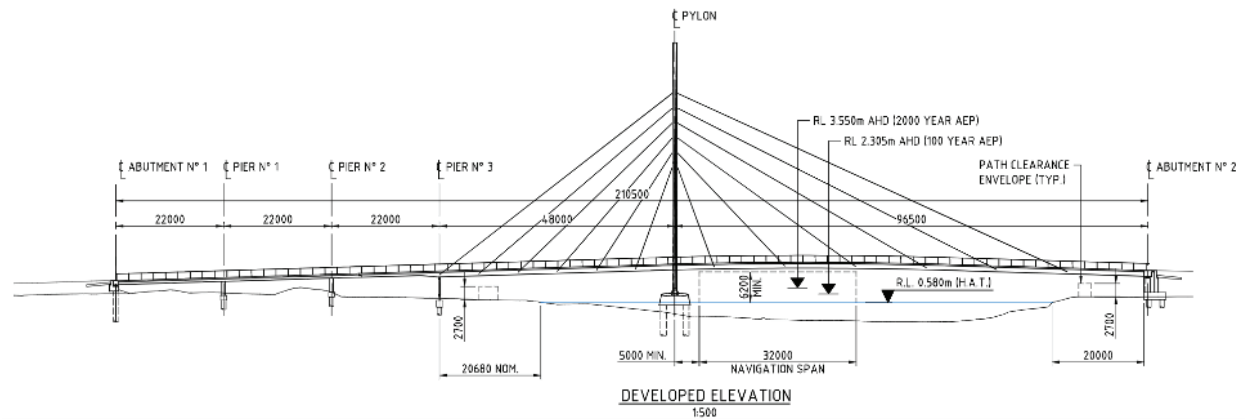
Elevation of the proposed bridge connecting Point Fraser to Heirrisson island (Source: WSP)
